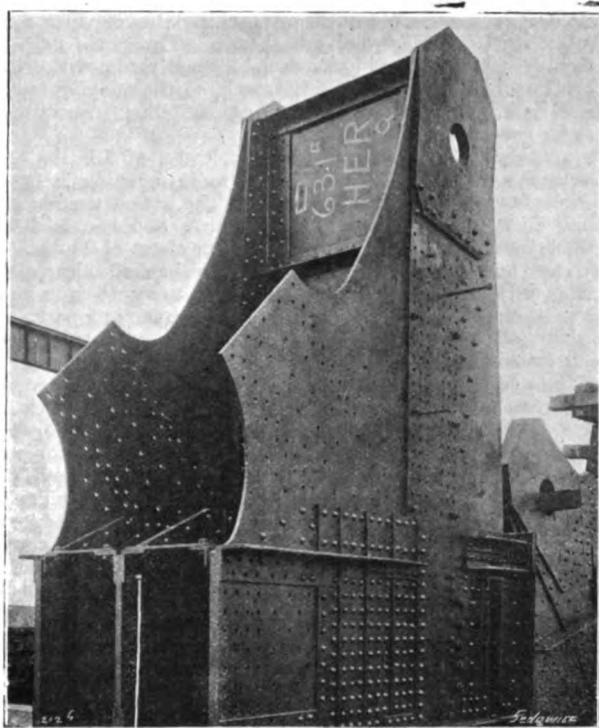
BOTTOM CHORD CONNECTION; CENTRAL SPAN.
